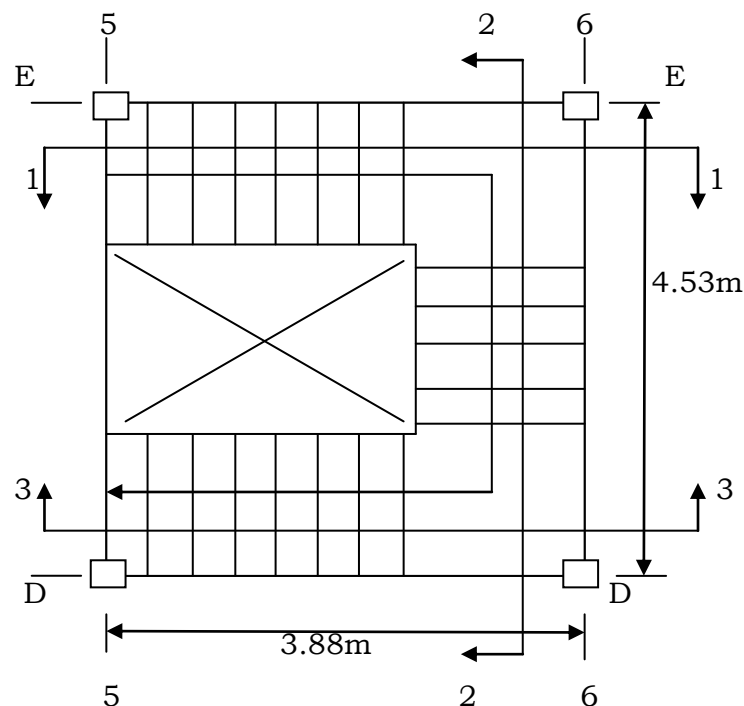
Typical Staircase from ground floor to 4<sup>th</sup> floor
